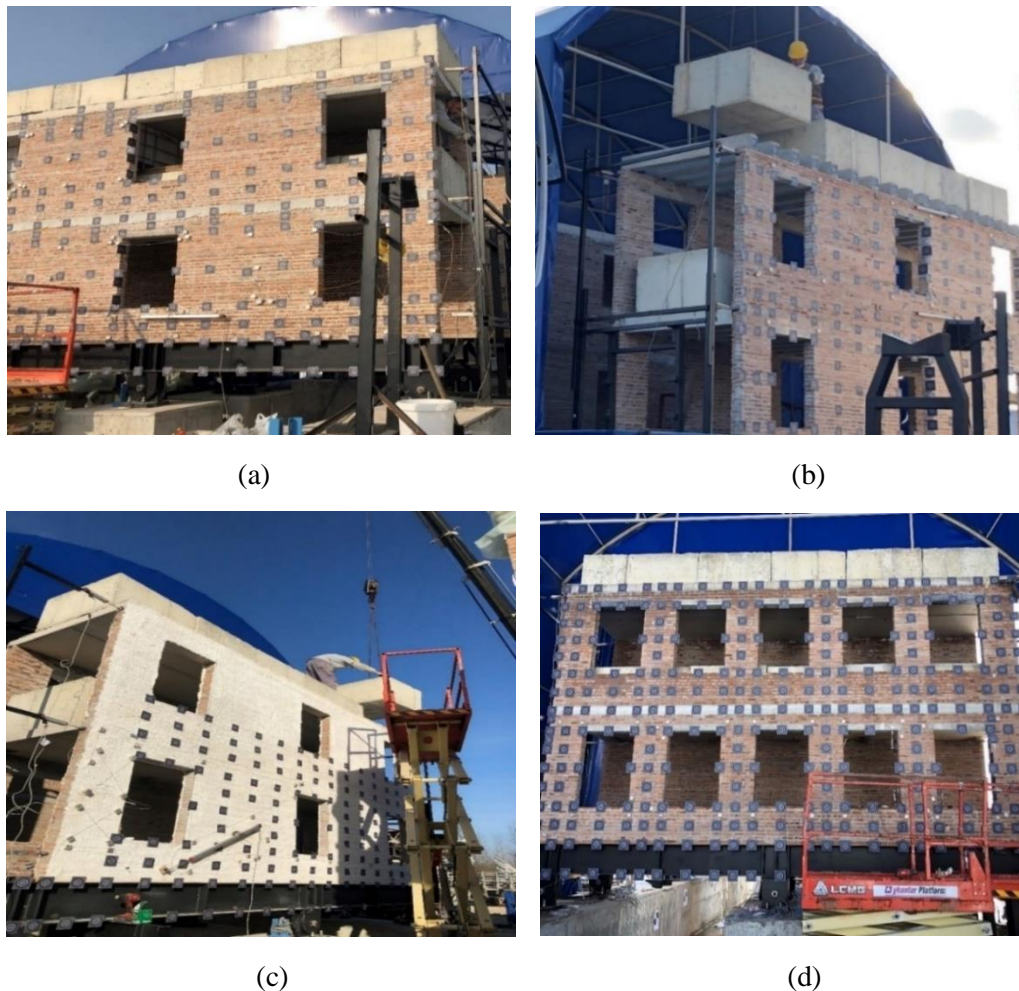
RC block loadings (a) on reference specimen, (b) on joisted specimen, (c) on retrofitted specimen (d) on combined specimen.
